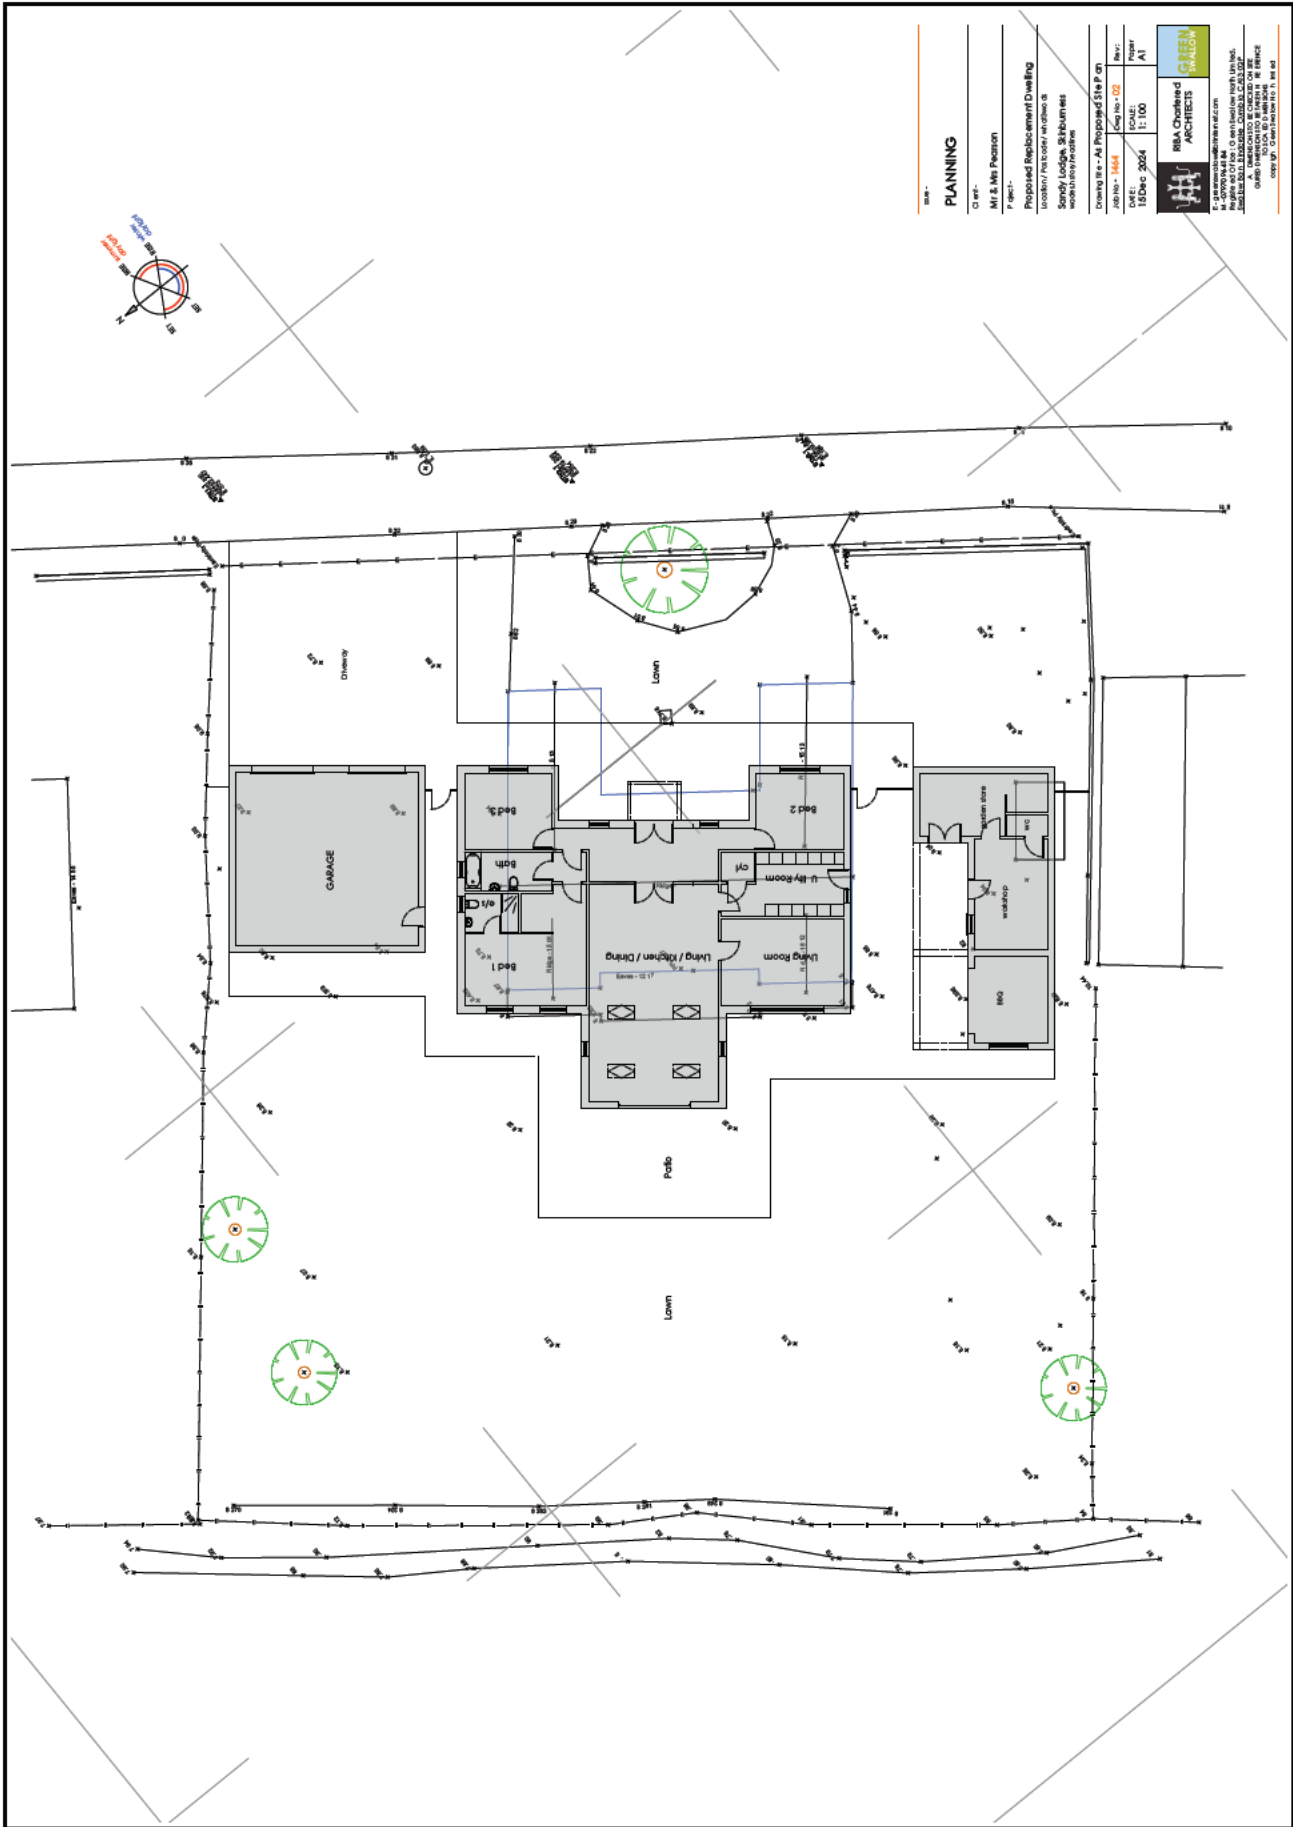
Proposed Replacement Dwelling - Sandy Lodge, Skinburness; As Proposed Site Plan. Drawing No. 1464 02 -, by Green Swallow North Ltd.
